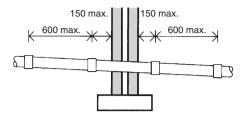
Pipe imbedded in the wall. Short length of pipe bedded in a wall with joints within 150 mm of either wallface. Additional rocker pipes (max length 600 mm) with flexible joints are then added
